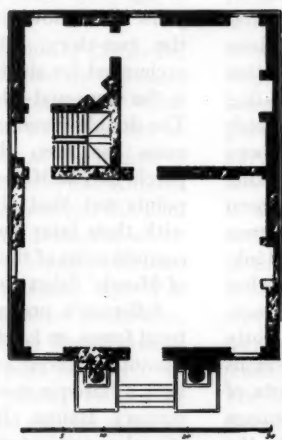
Plan of a Garden House, from Morris' *Select Architecture*, plate 9.
